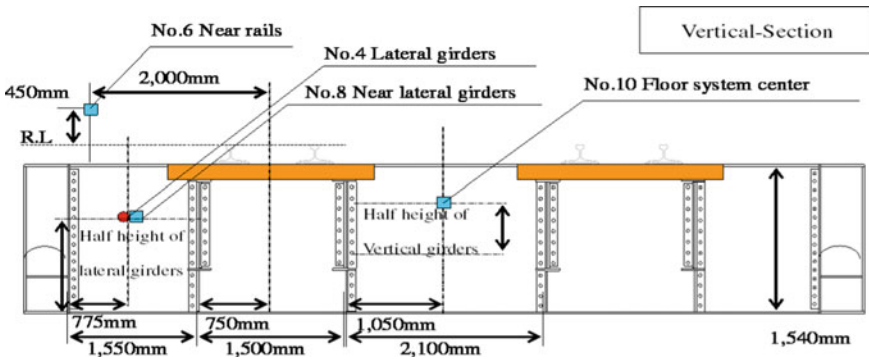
Measurement locations—near rails, lateral girders, floor system center
